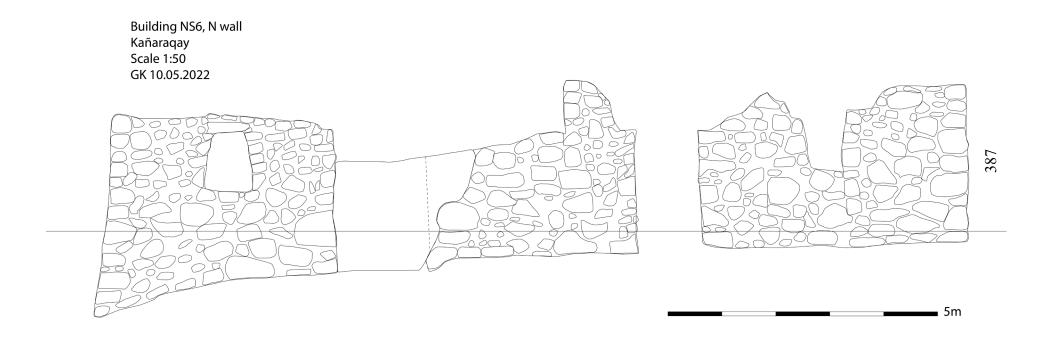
Outside elevation of the North wall of Building NS6, Kañaraqay
